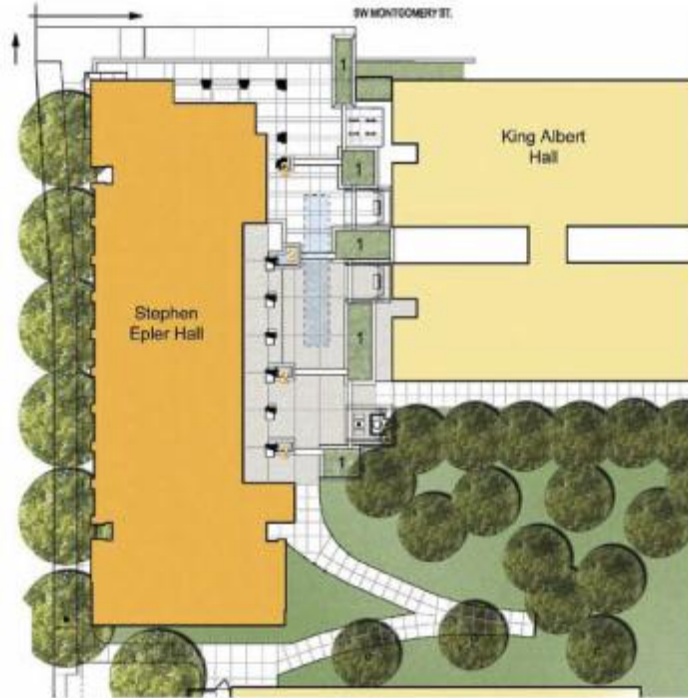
Stephen Epler Storm-water Courtyard plan. *Source:* Pennypacker 2008, 30.
